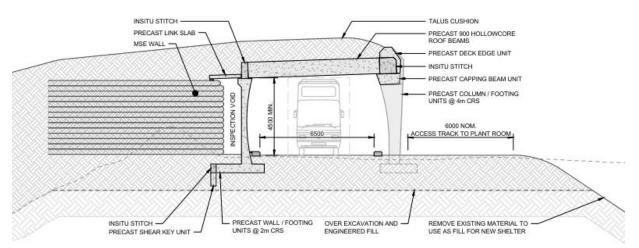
Typical section through RC portal frame with structurally independent MSE wall
